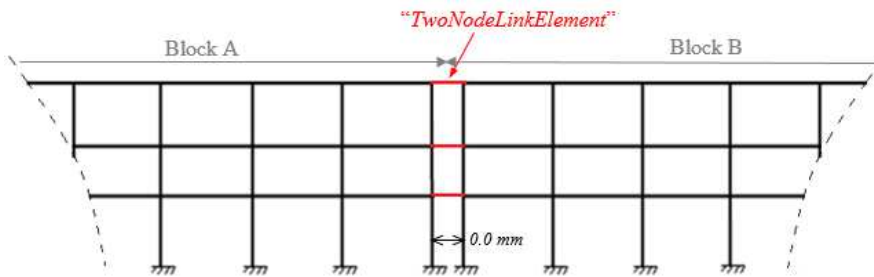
Structural model adopted for beam-column connections at the thermal joints
